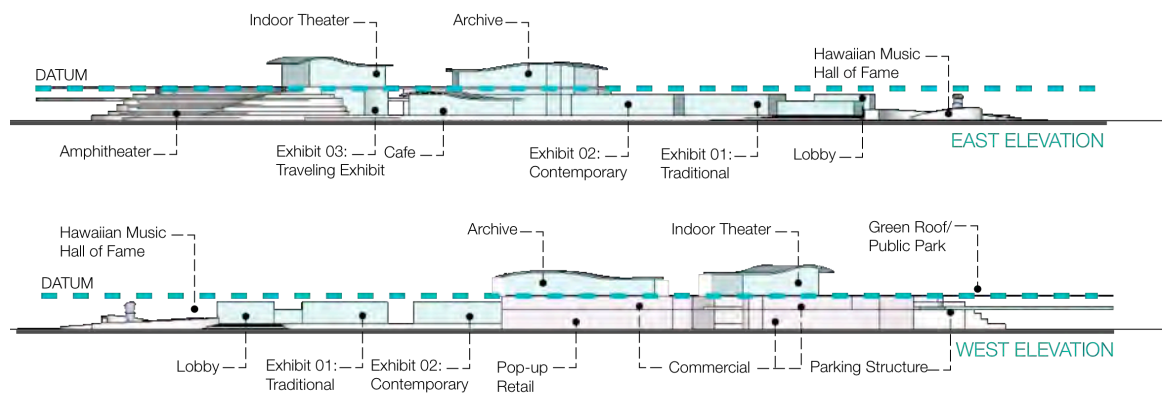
Site Elevations showing reference to Datum. Drawn by Author.
